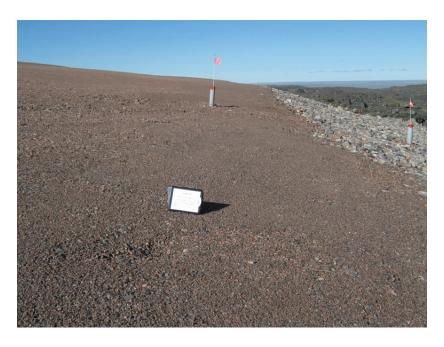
Facing north from the southeast corner of the rip-rap. ____ ↑
